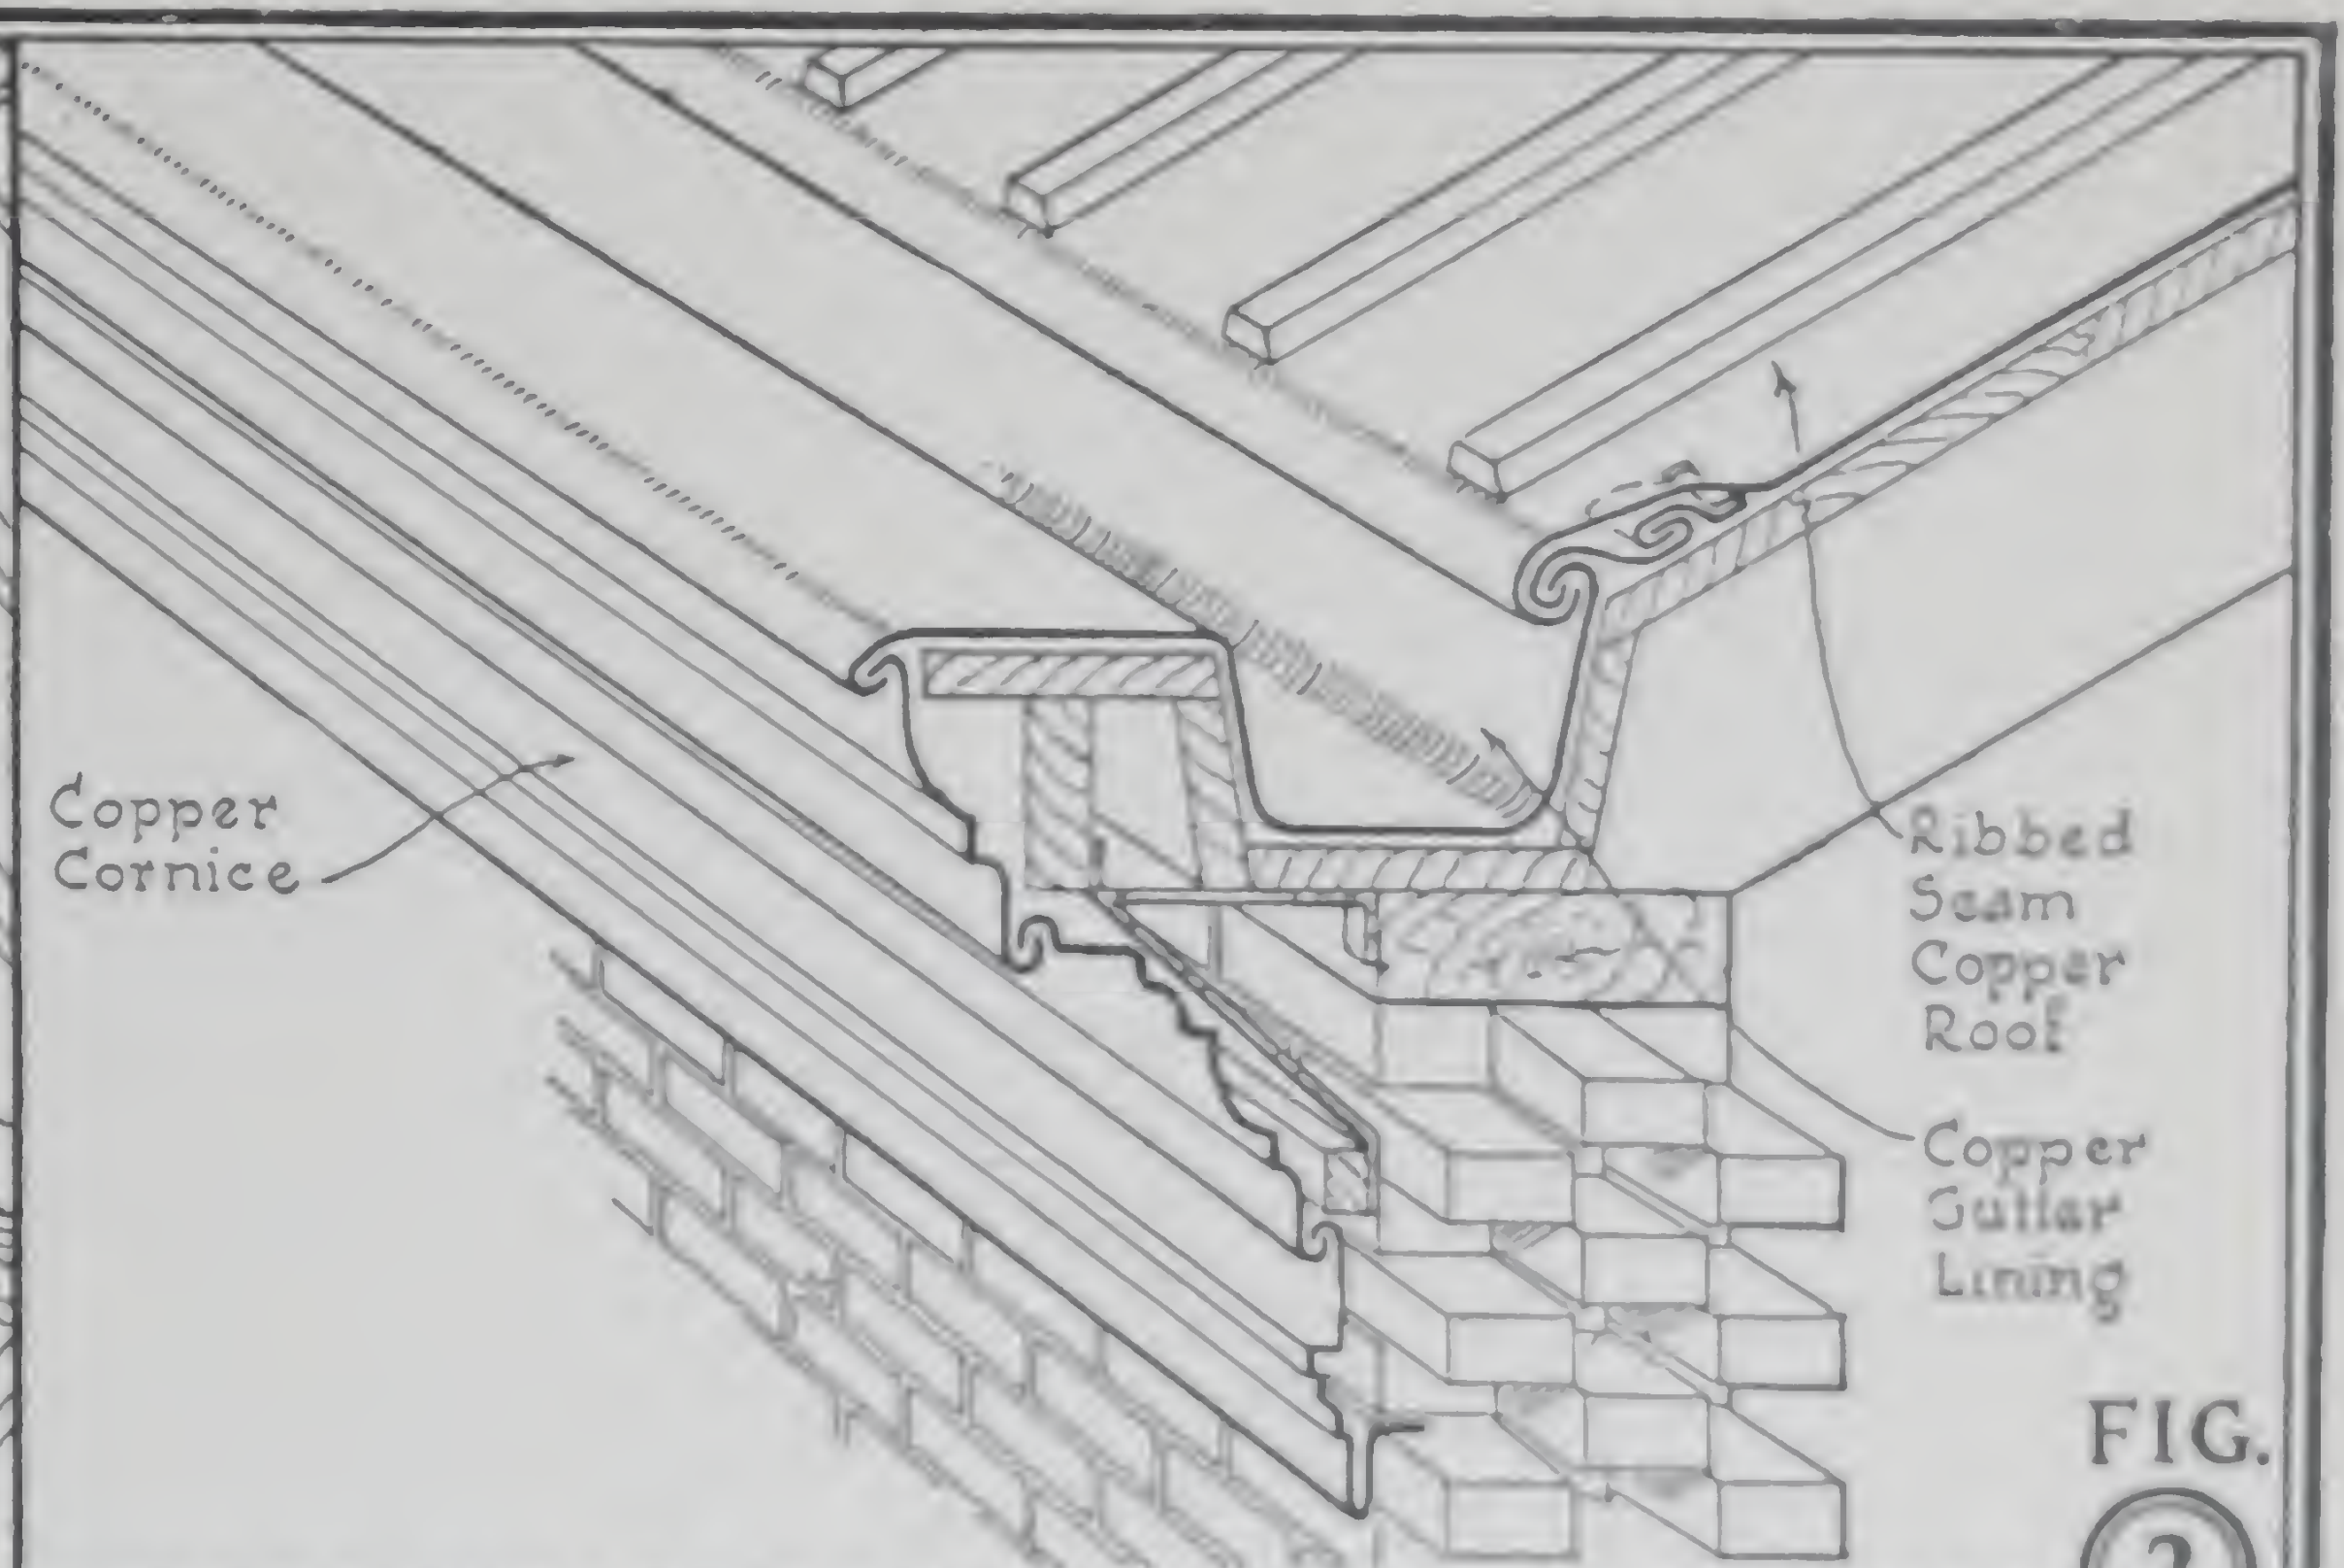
DETAIL SHOWING APPLICATION OF RIBBED SEAM COPPER ROOFING
